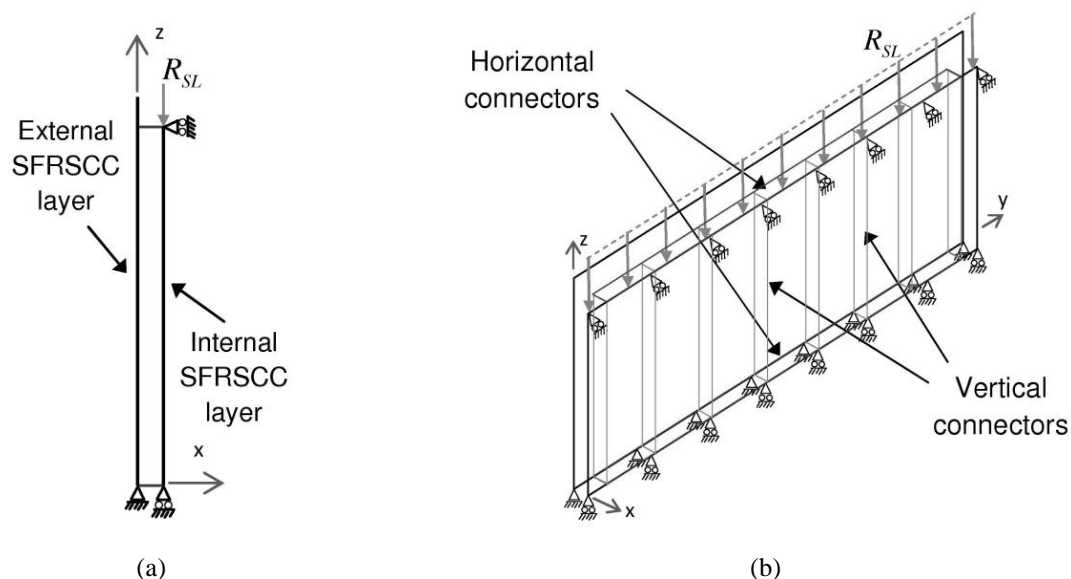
Schematic representation of support conditions and forces transferred by the slab: (a) cross-section; (b) perspective view.
